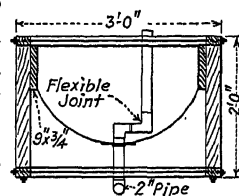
SIDE ELEVATION OF SLUDGE BOX.
